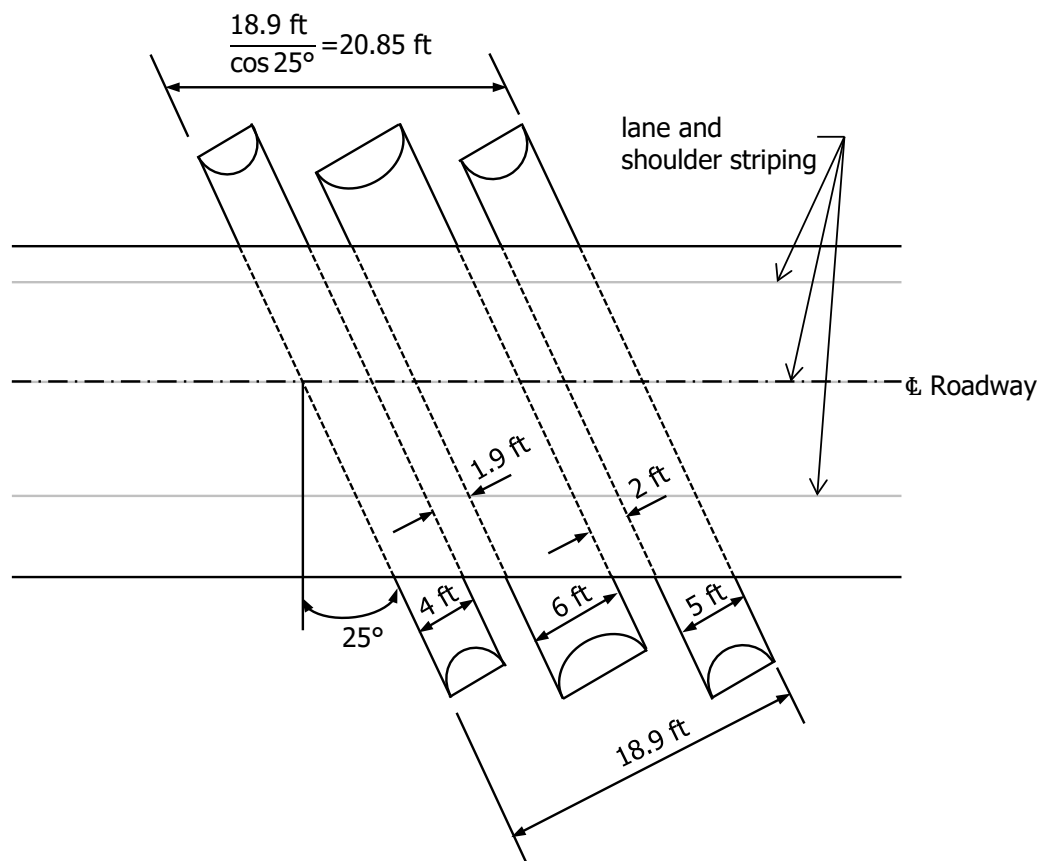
Plan view of a skewed, multi-pipe culvert under fill.
